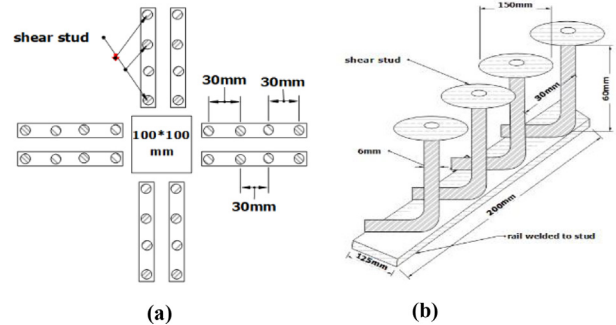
(a) Shear stud, (b) Shear stud arrangement.
